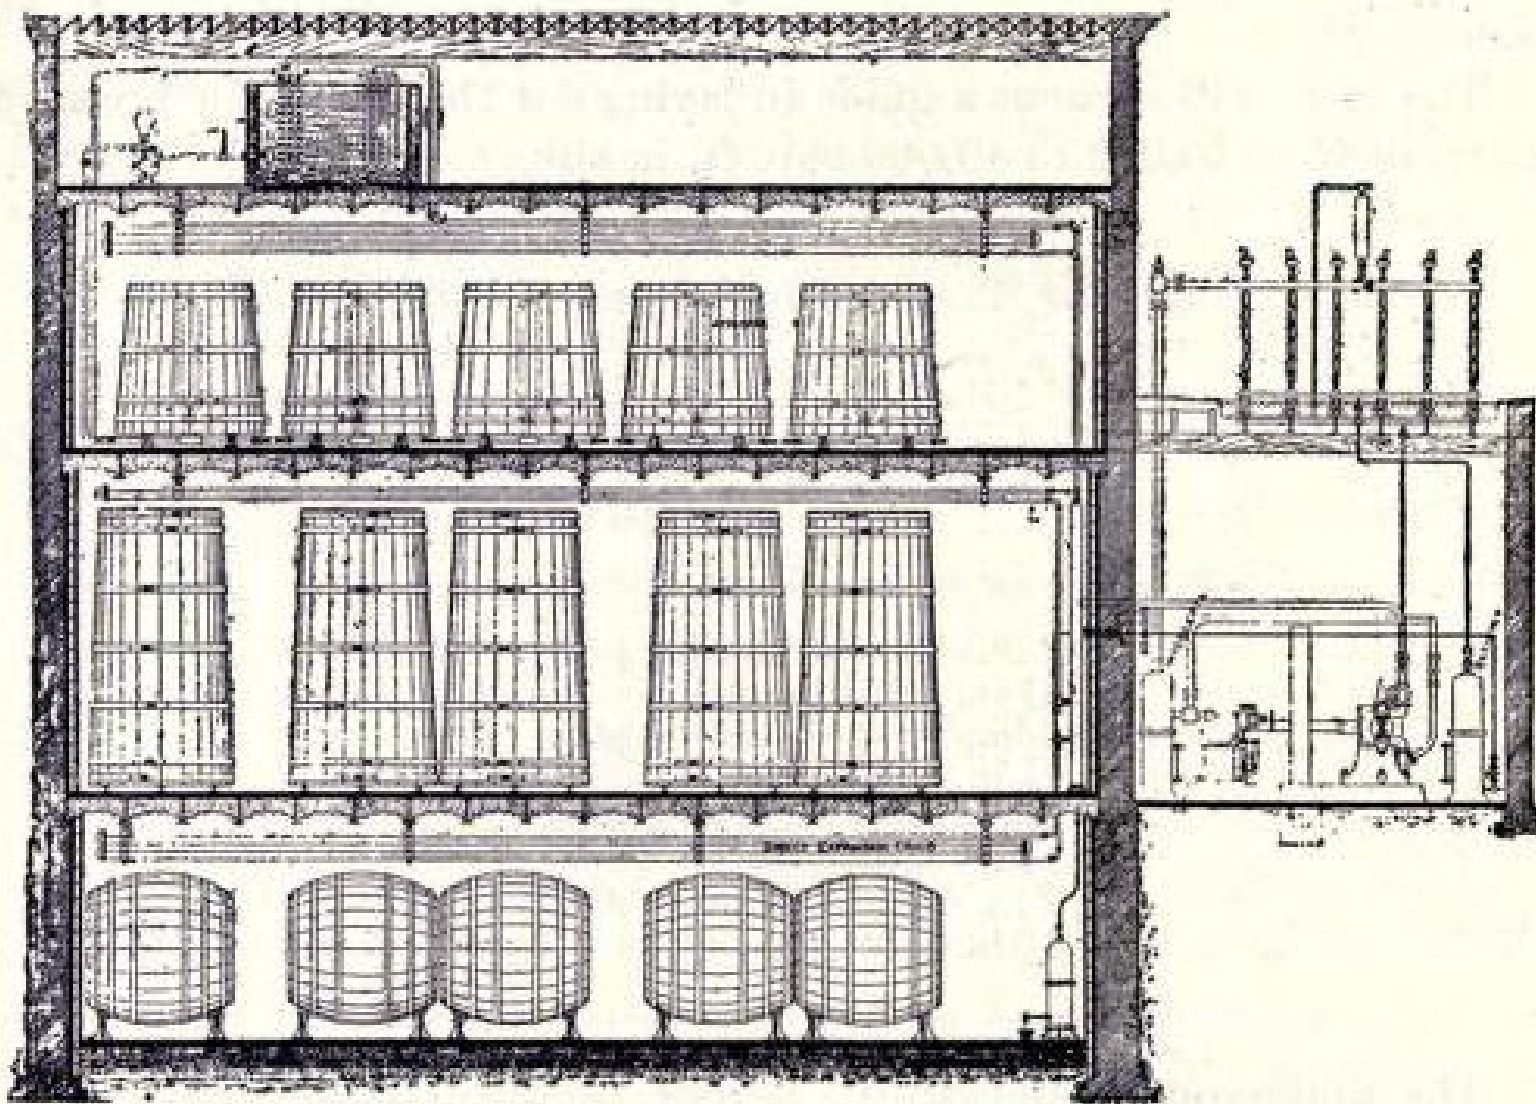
Triumph Ice Machine Company, Small Brewery with Refrigerating Machinery working on the Direct Expansion System. Sectional Elevation.
